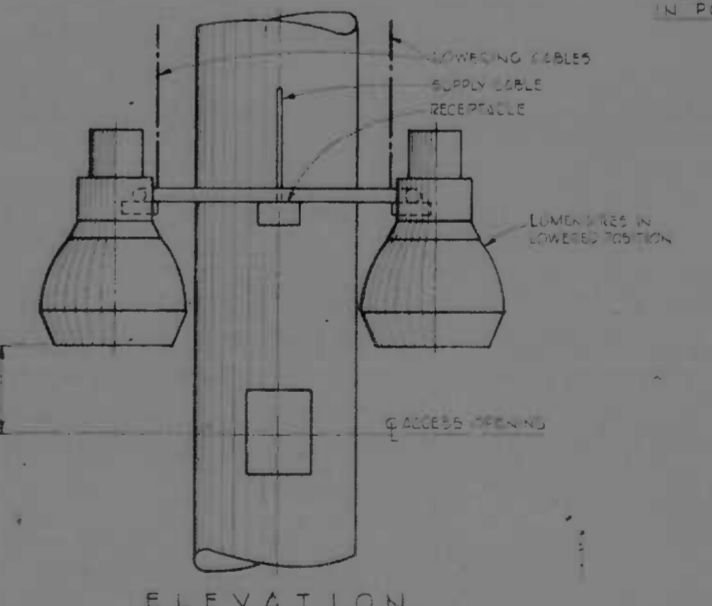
DETAIL - TYPE III INSTALLATION SHOWING LIGHTING STANDARD MODIFICATIONS A AND B NOT TO SCALE
